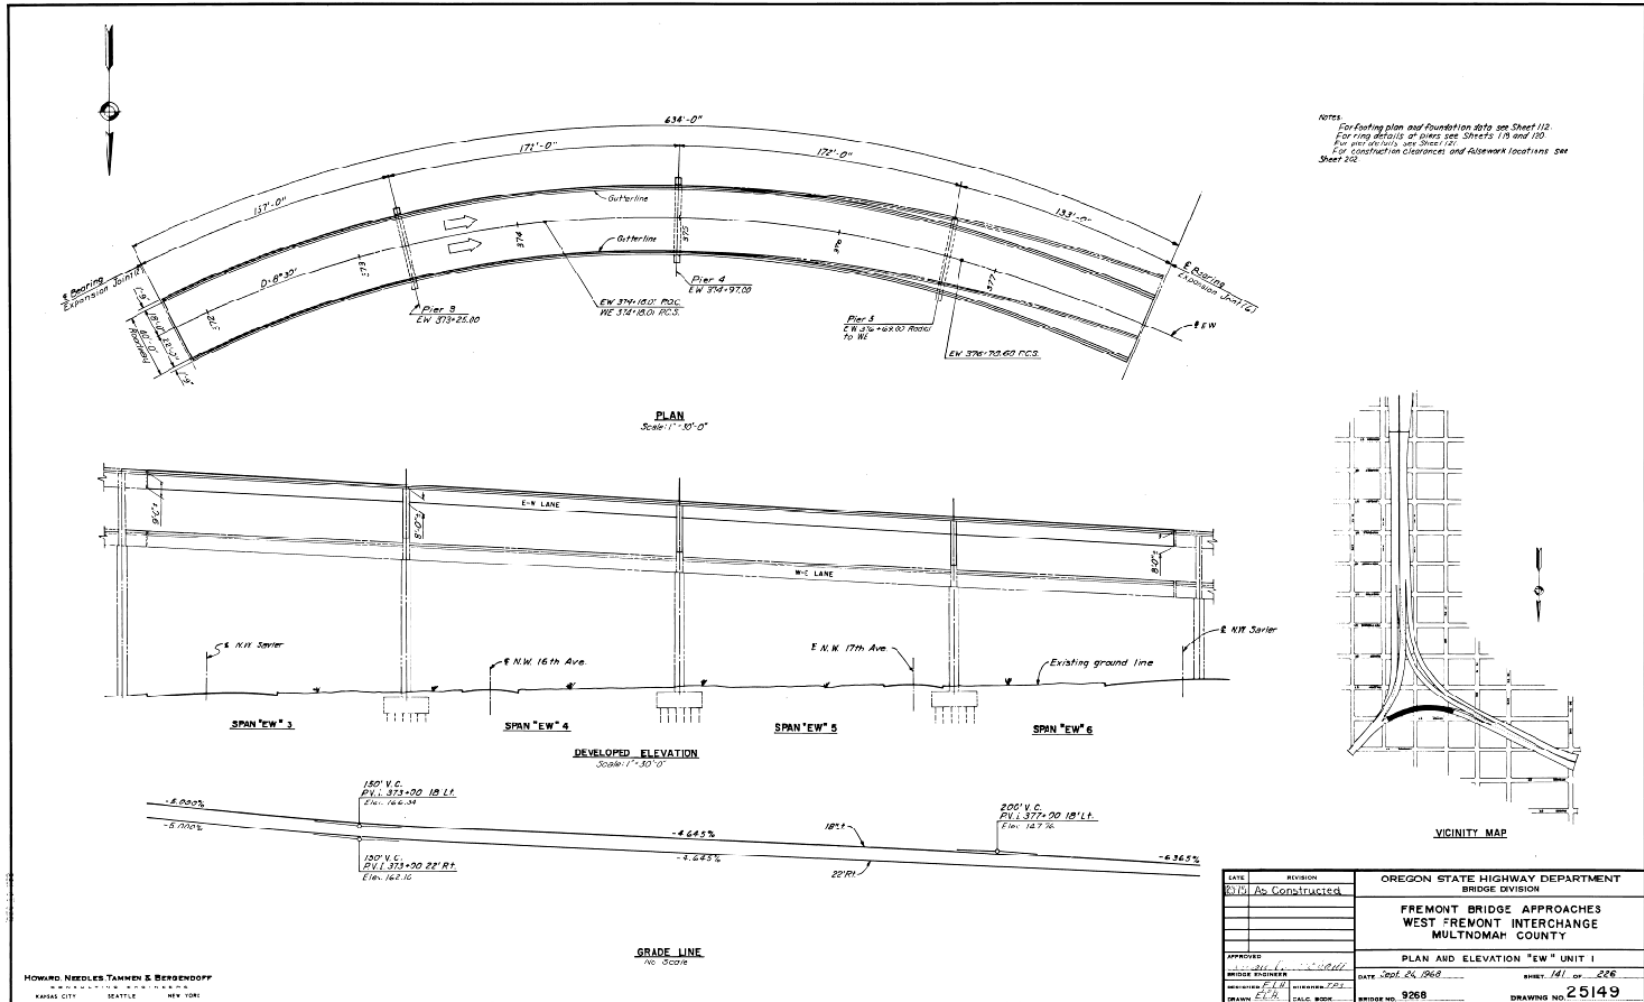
Plan and elevation views of EW Unit 1 Bridge superstructure 09268W.
